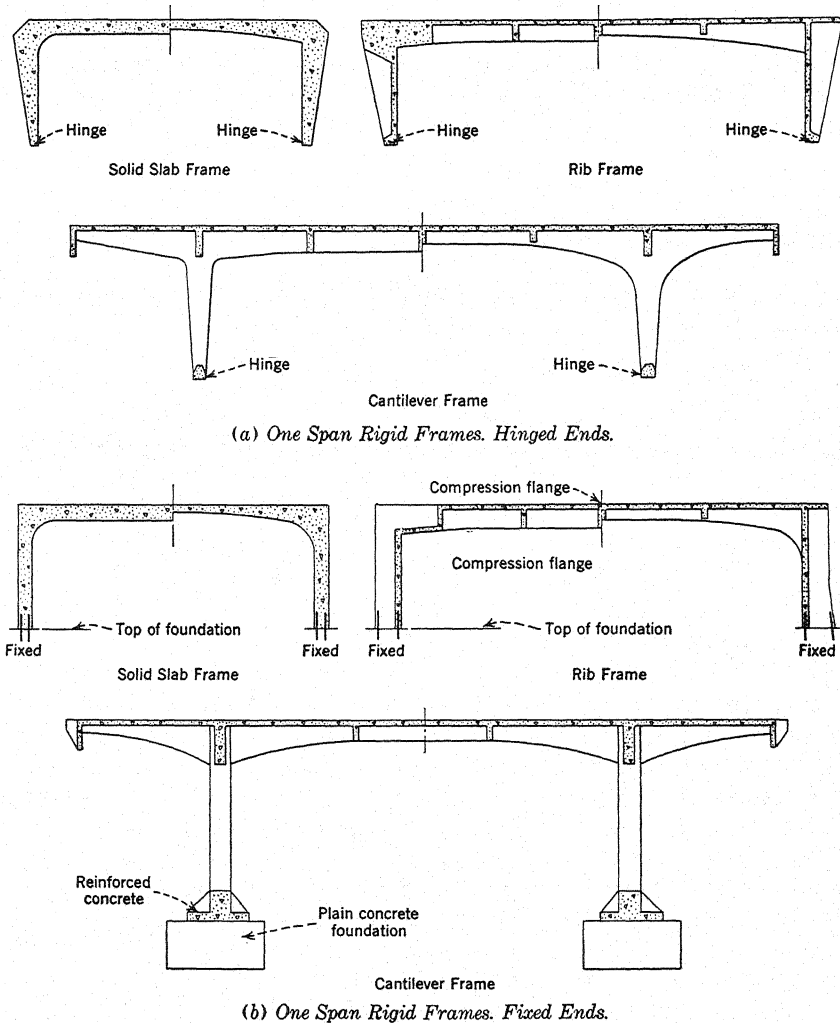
Typical One-Span Rigid Frames. (See p. 268.)
